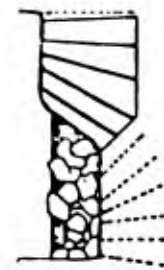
Drilled and cast-in-place shaft collar (inside large-diameter drilled pier)
